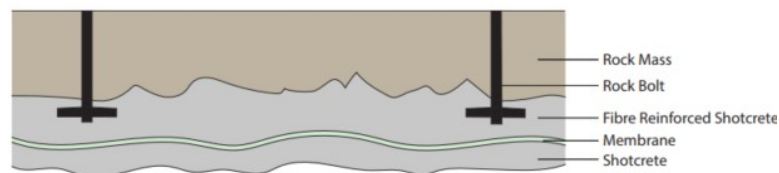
Sprayed concrete lining cross-section in hard rock tunneling [12].
